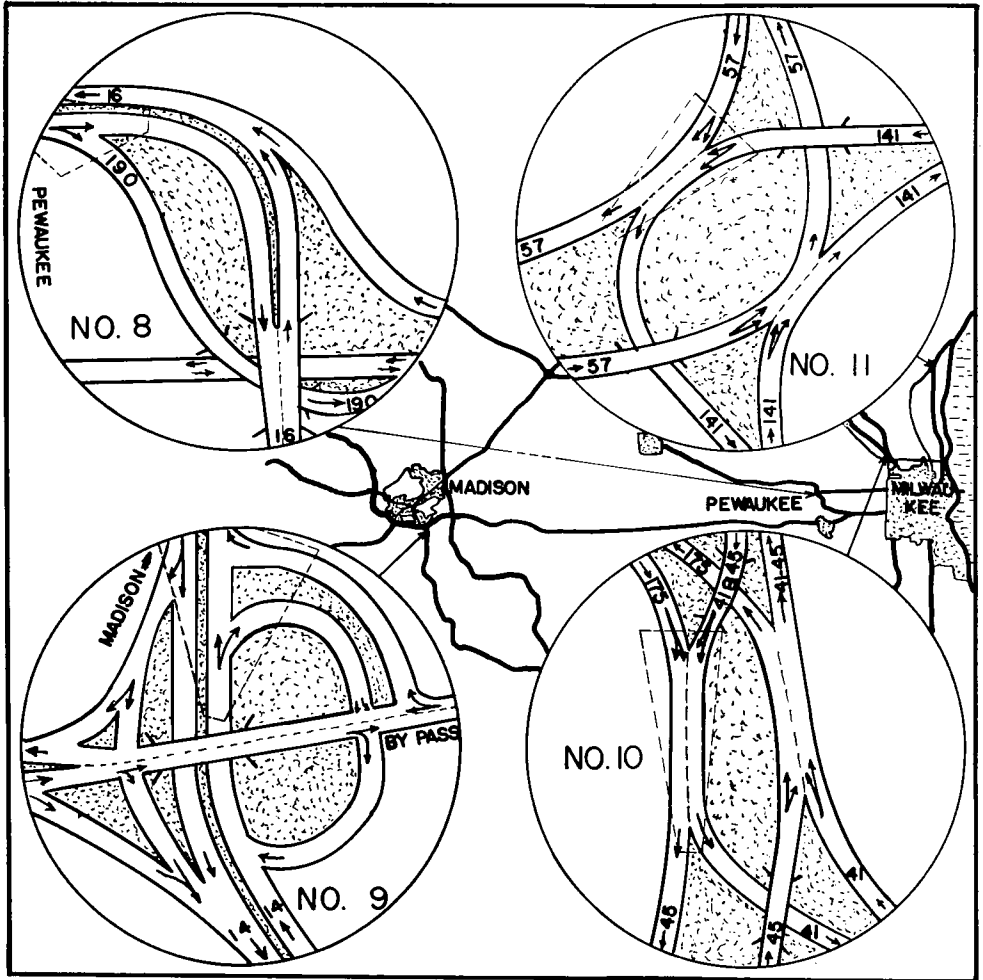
Plan views of intersections 8, 9, 10 and 11.
